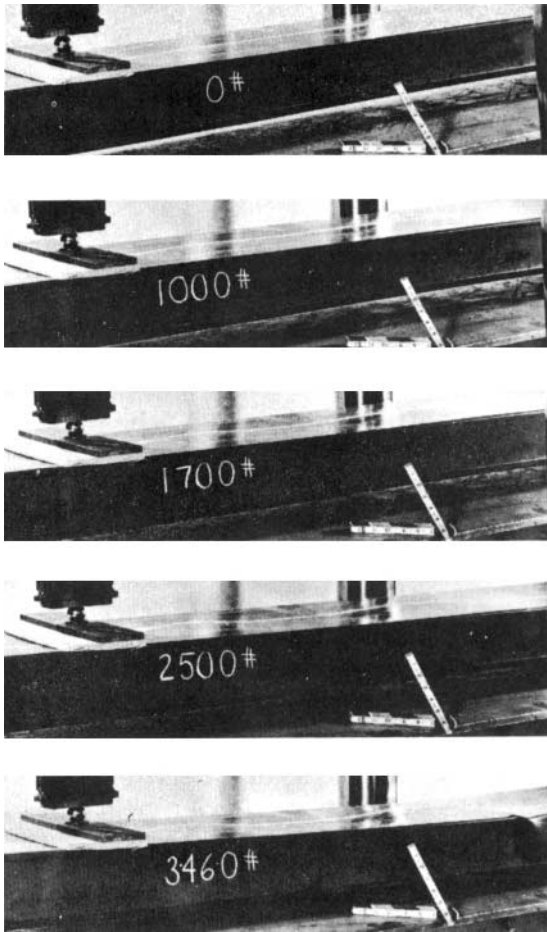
Consecutive load stages on hat-shaped beam.^{1.7}
